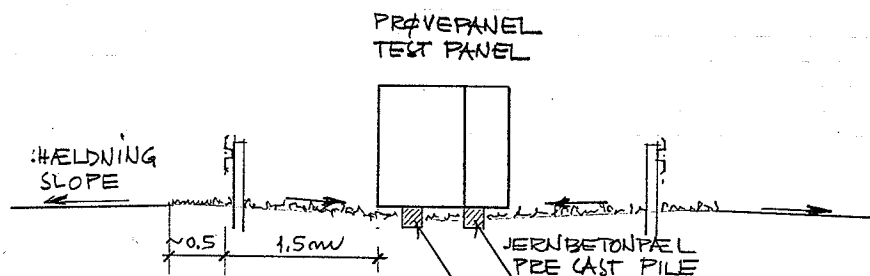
Exposure site in central reservation, sectional view A 1:75.
